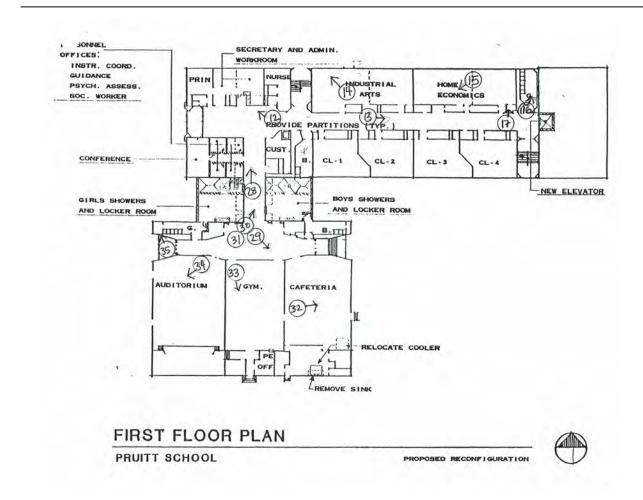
First floor plan and photo map (Plan courtesy of KIPP Inspire Academy).
